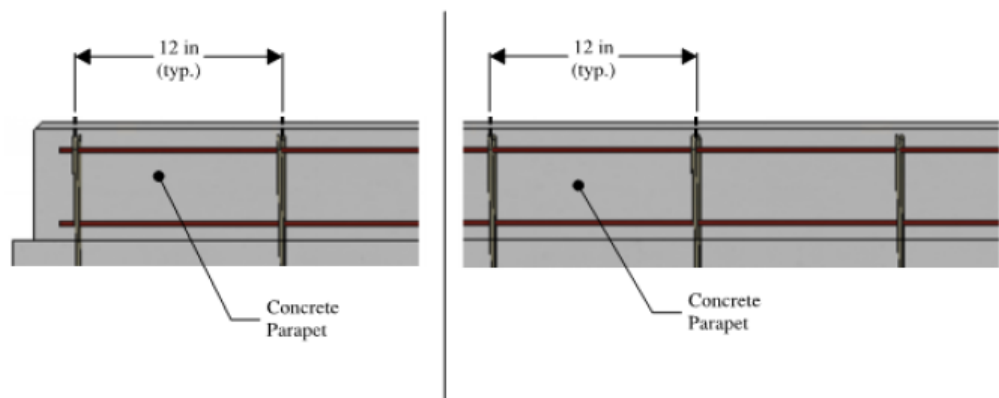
Elevation View of Bridge Rail System at Ends/Joints
